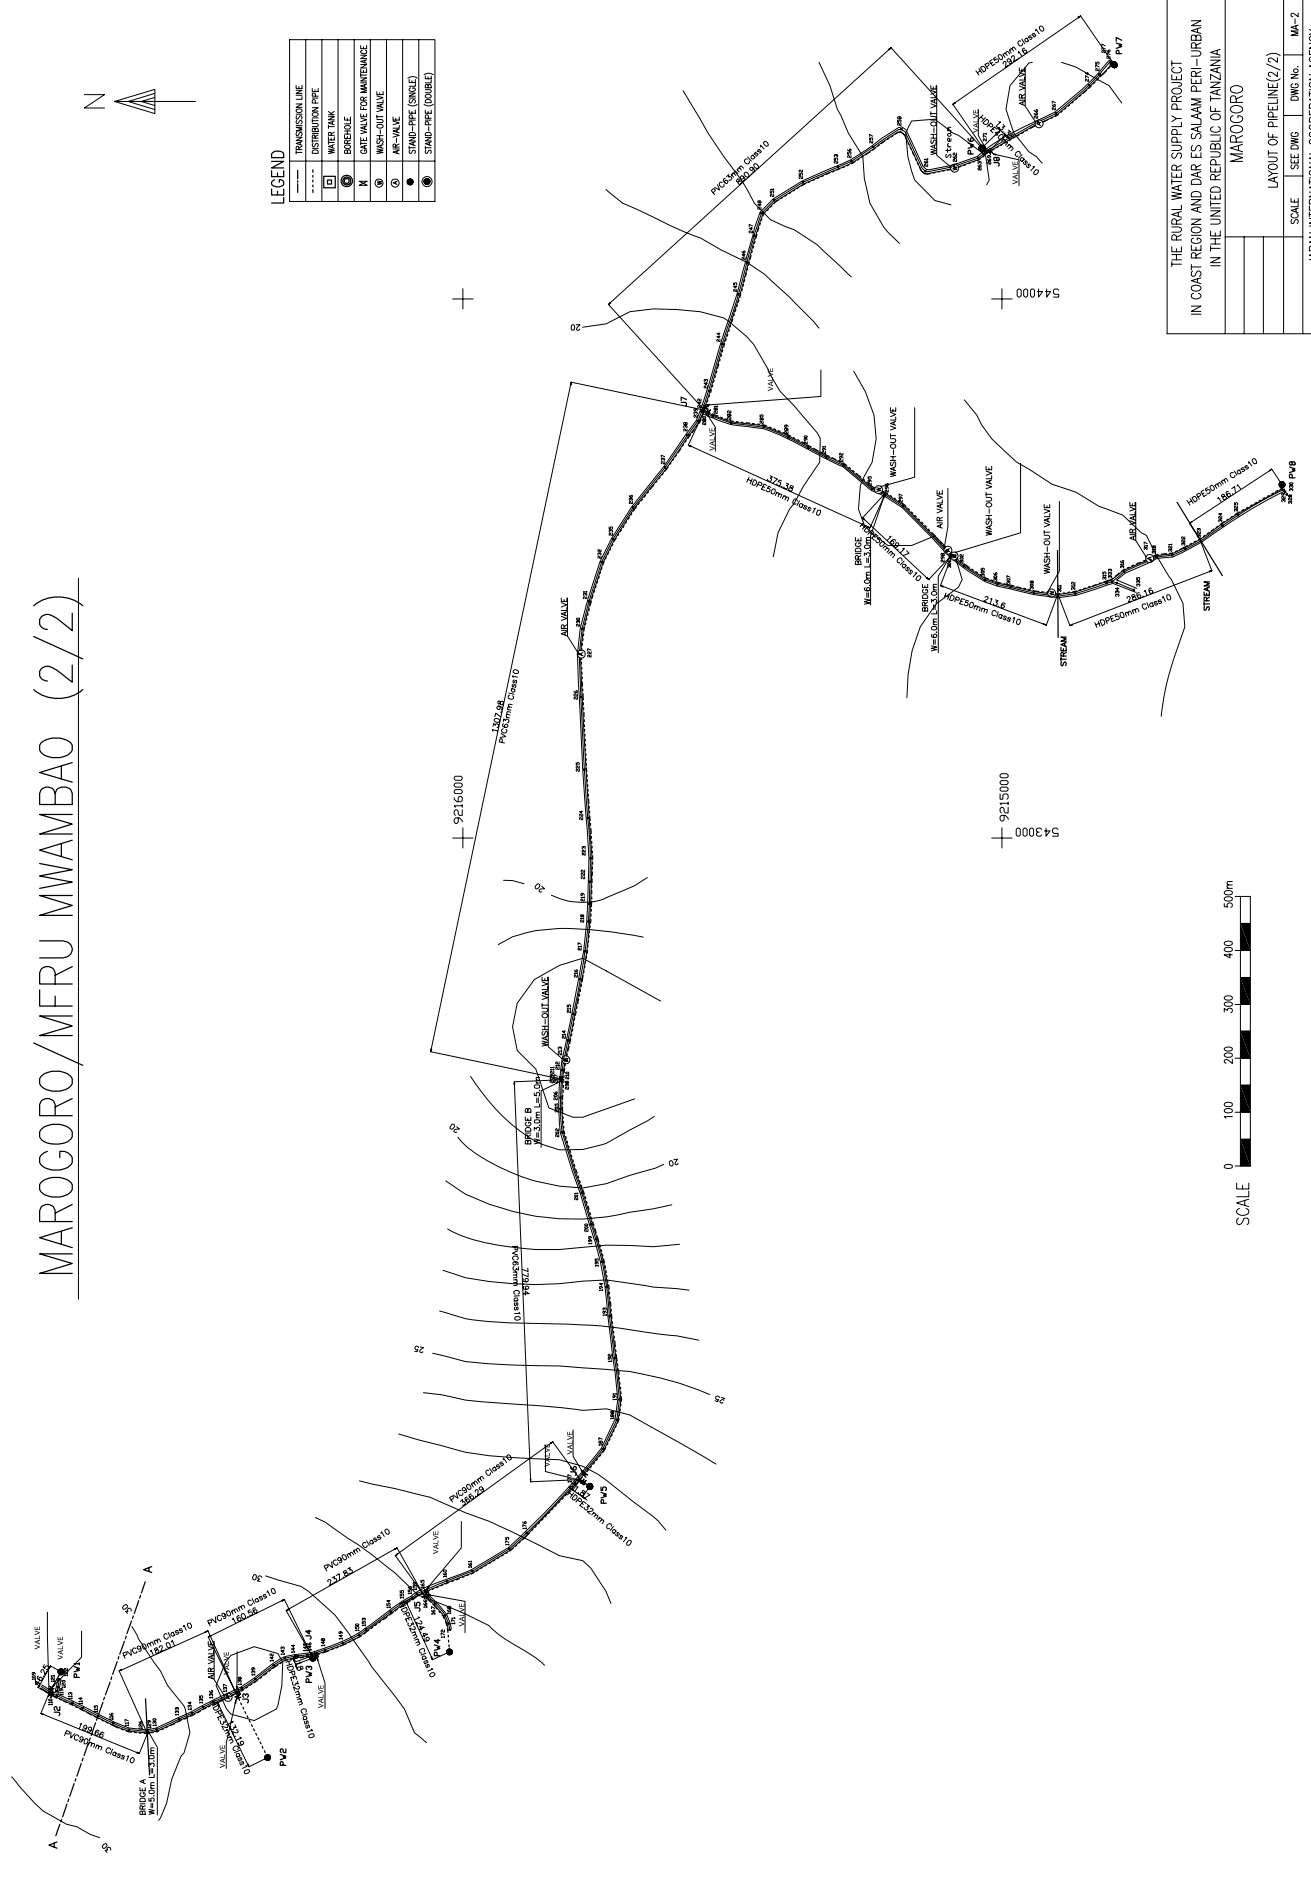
Layout Plan of Water Supply Facility (Marogoro/Mfuru Mwambao)
